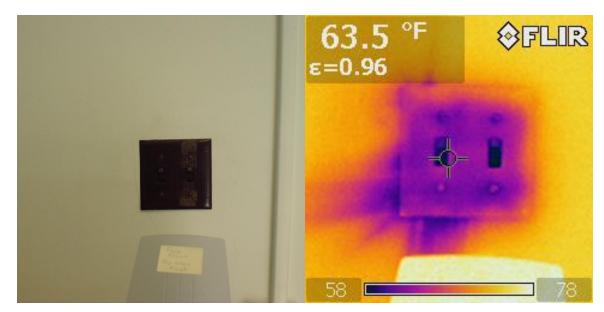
Infiltration Detection—Light Switch on Exterior Wall
